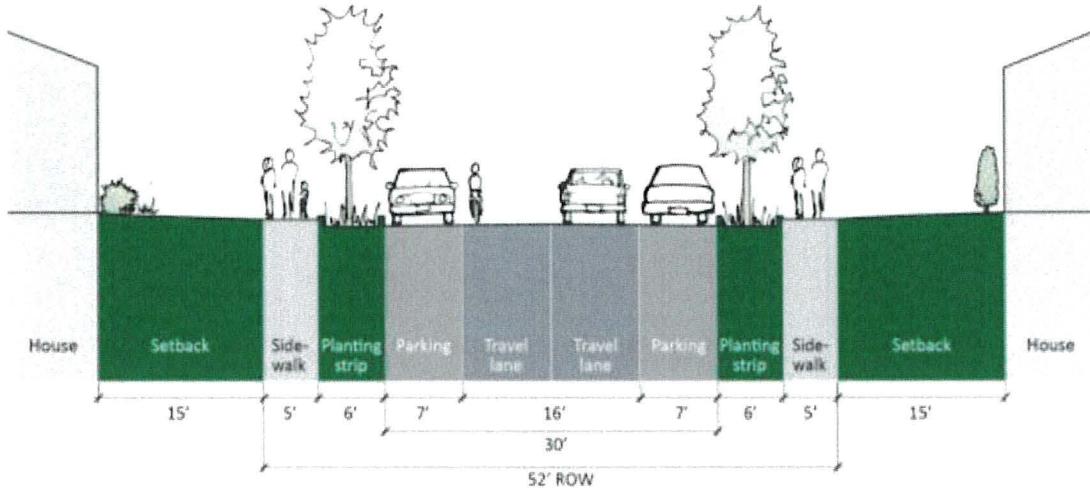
Cross-sections for local access street design options (with standard dimensions).
